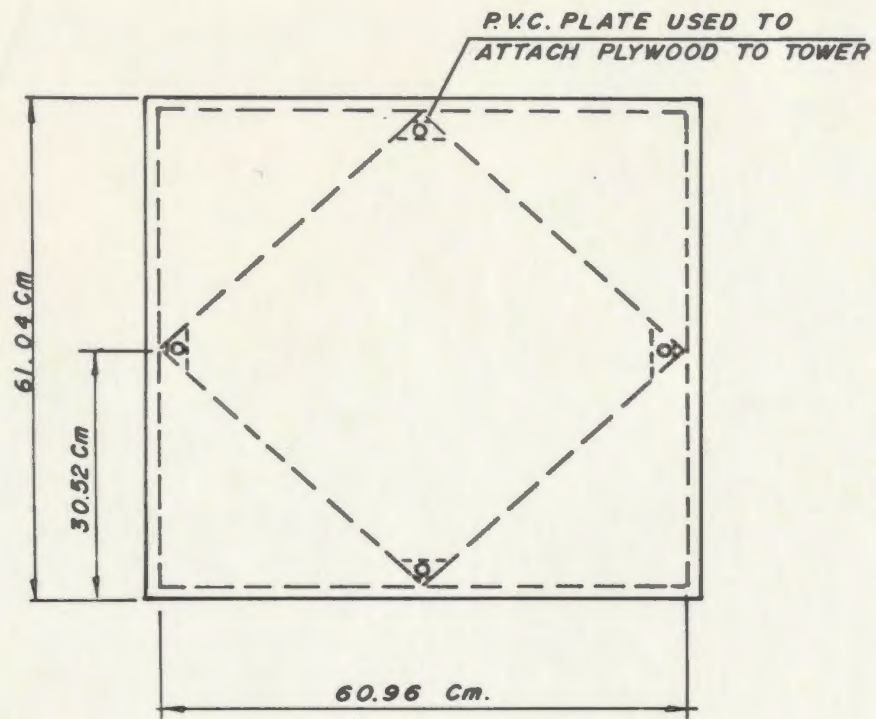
PLAN VIEW OF STRUCTURE DECK
